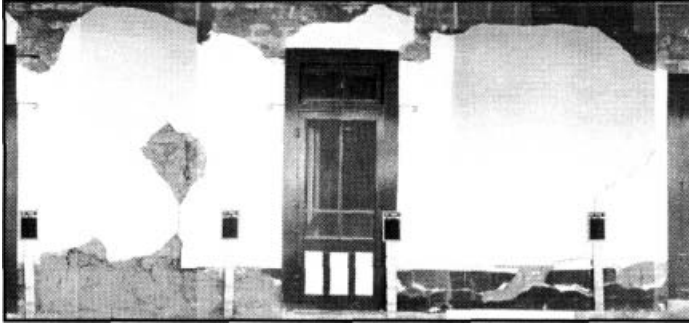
East wall of west wing. Flexural crack extends from upper left diagonally to the base of the wall and along the base.
